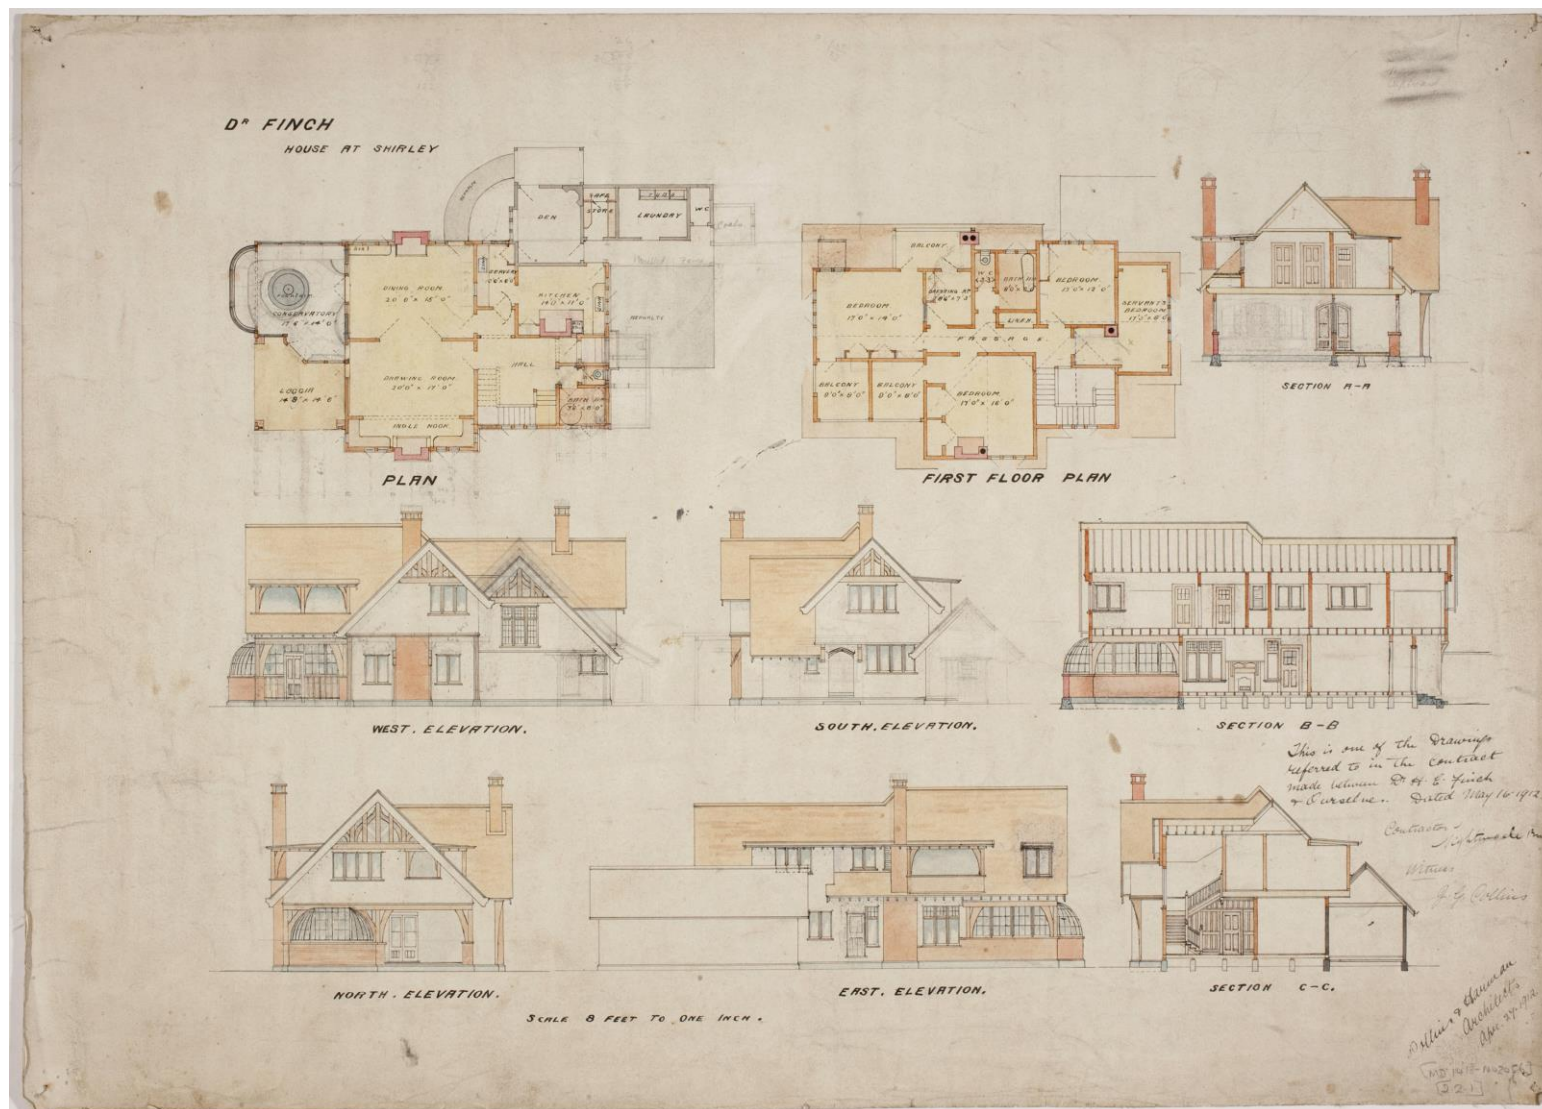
Collins and Harman, Dr Finch, House at Shirley, plans, elevations and sections (1912).
